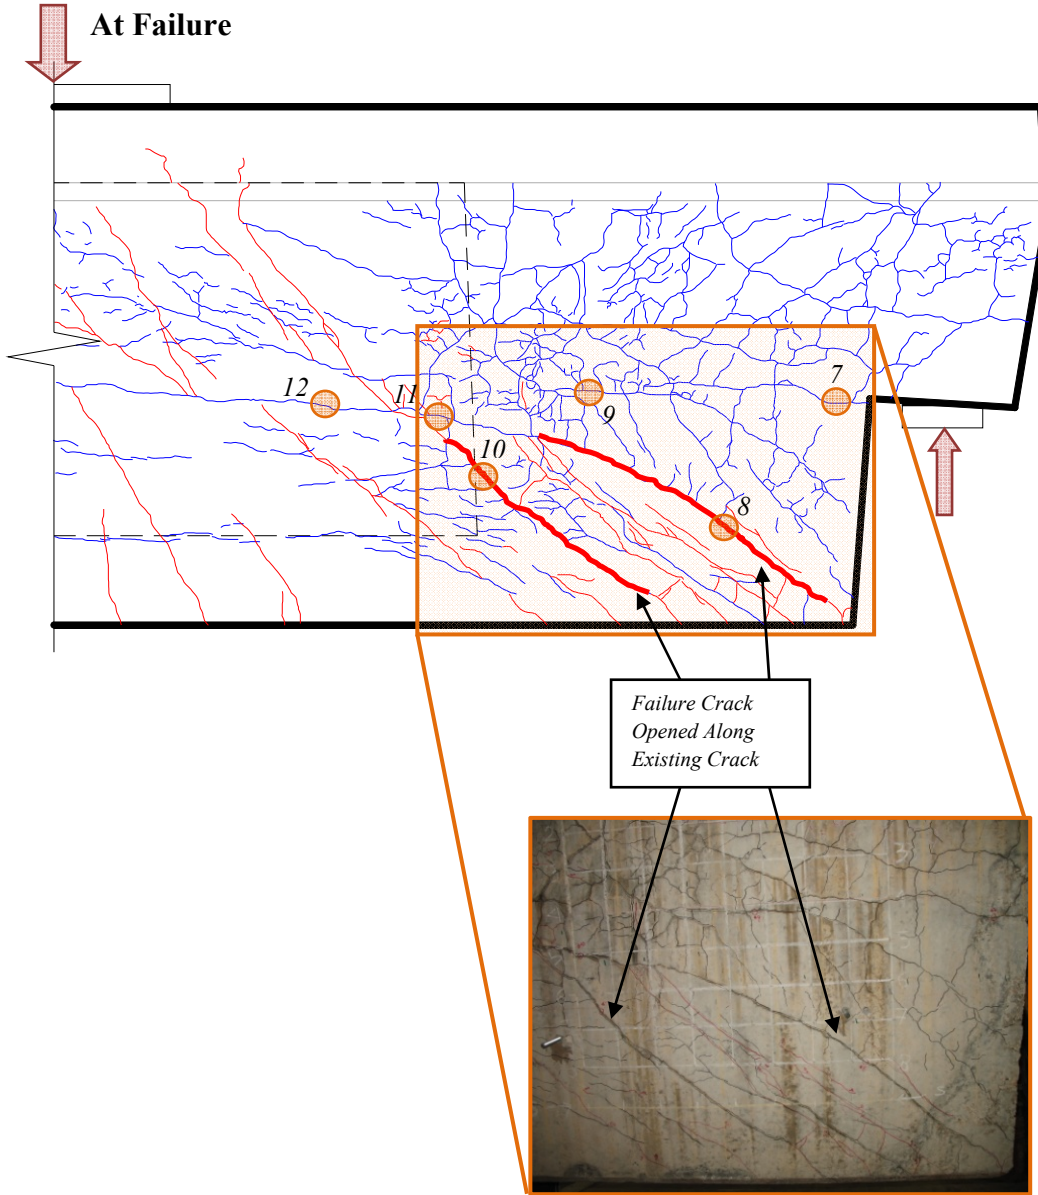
Cracking on the east side of beam RF-3R-9(c) after failure.
